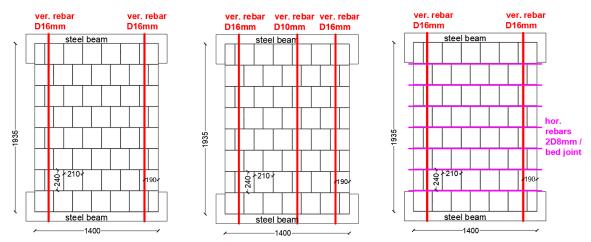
Reinforcing details of the tested at the Laboratory specimens
